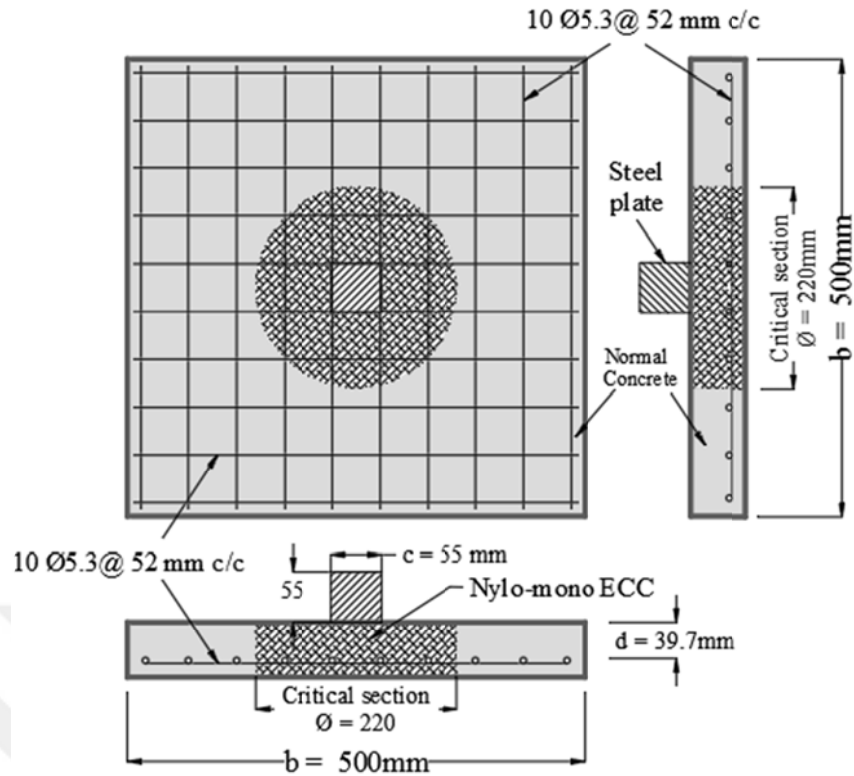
Typical slab geometry and reinforcement details for slabs of Groups II and VI
